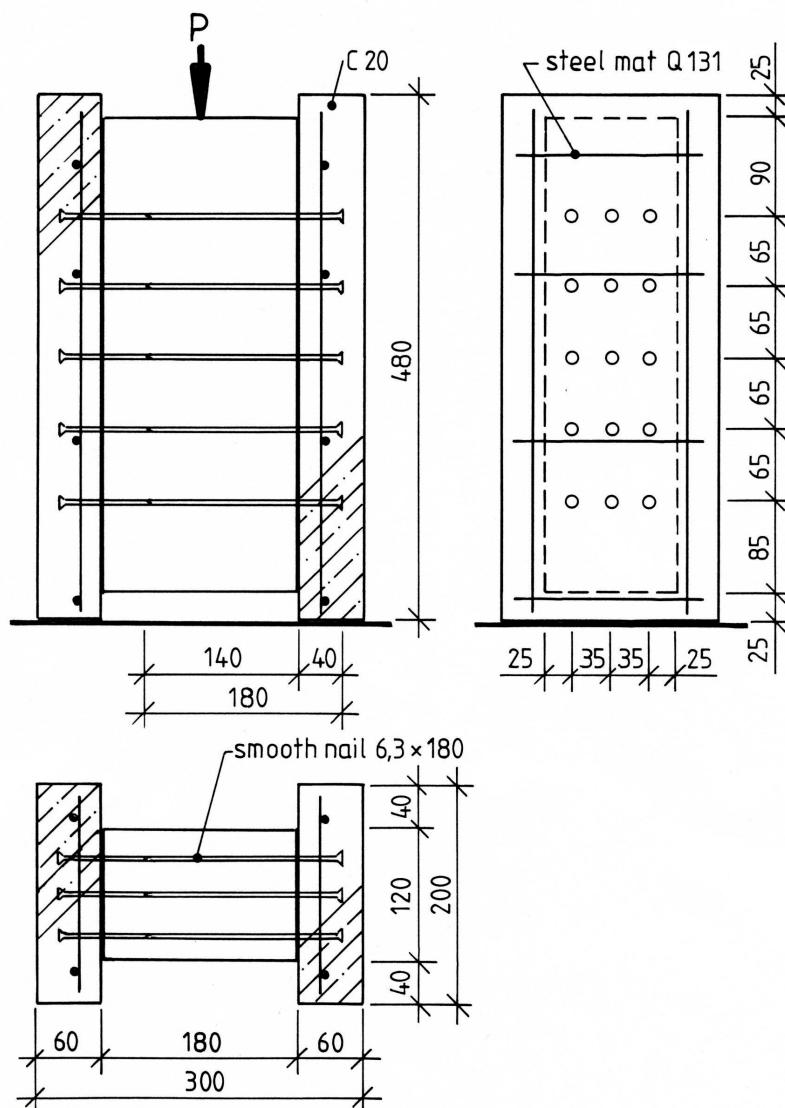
Timber-concrete composite compression shear test specimen used for smooth nail connections [3]
